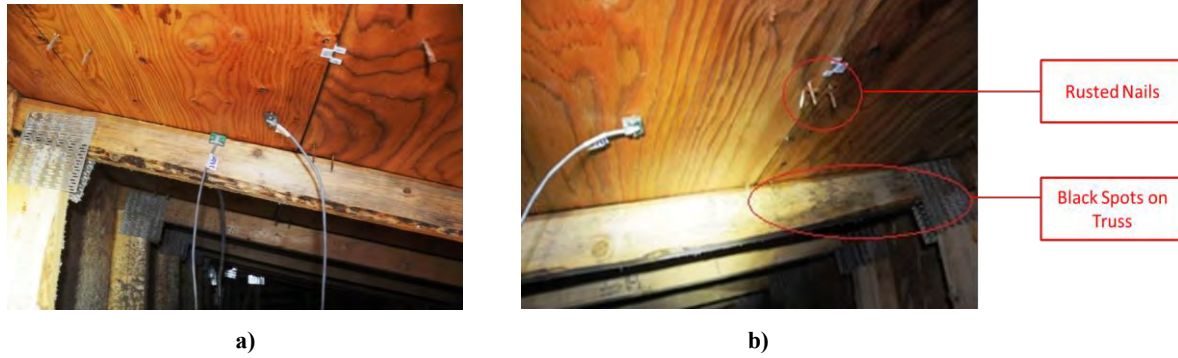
Field Observation in the Attic of House III: a) Wet Plywood Sheathing; b) Rusty Nails and Black Spot on Truss
